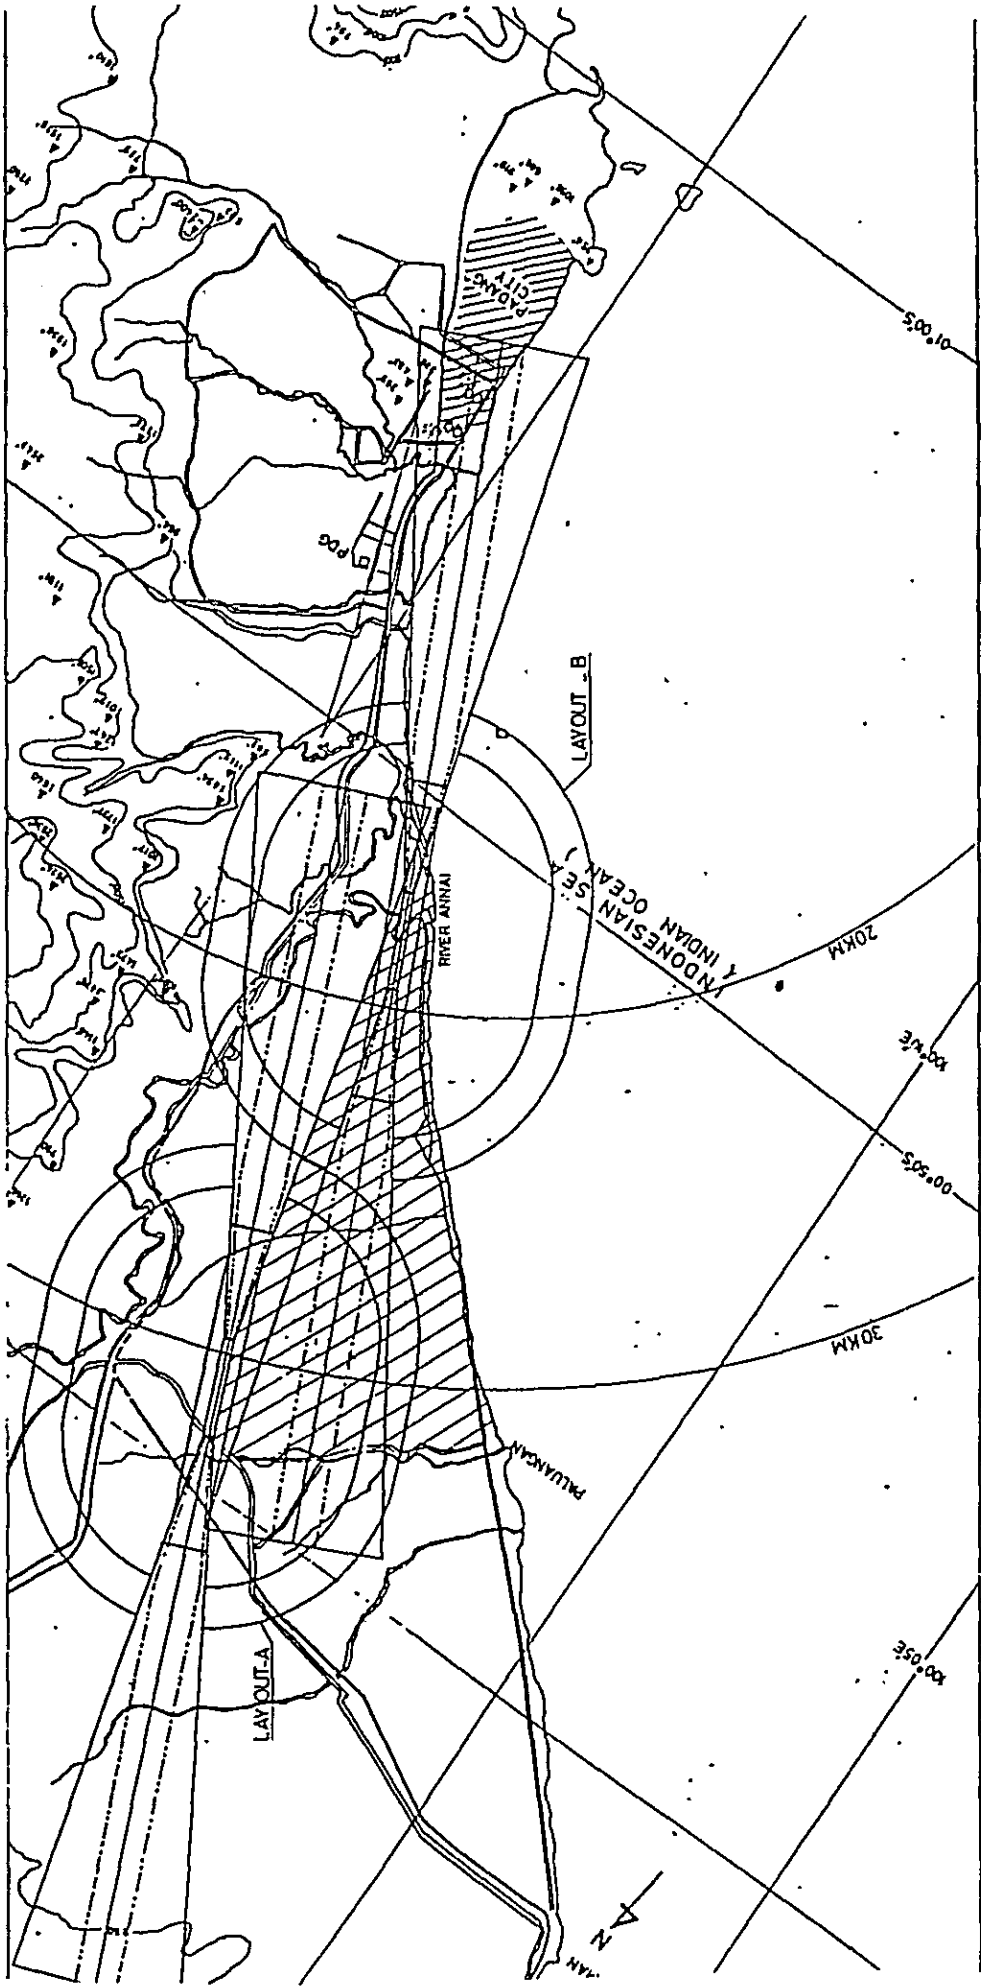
2.3 POSSIBLE SITE AND REQUIRED AIRSPACE LAYOUT
